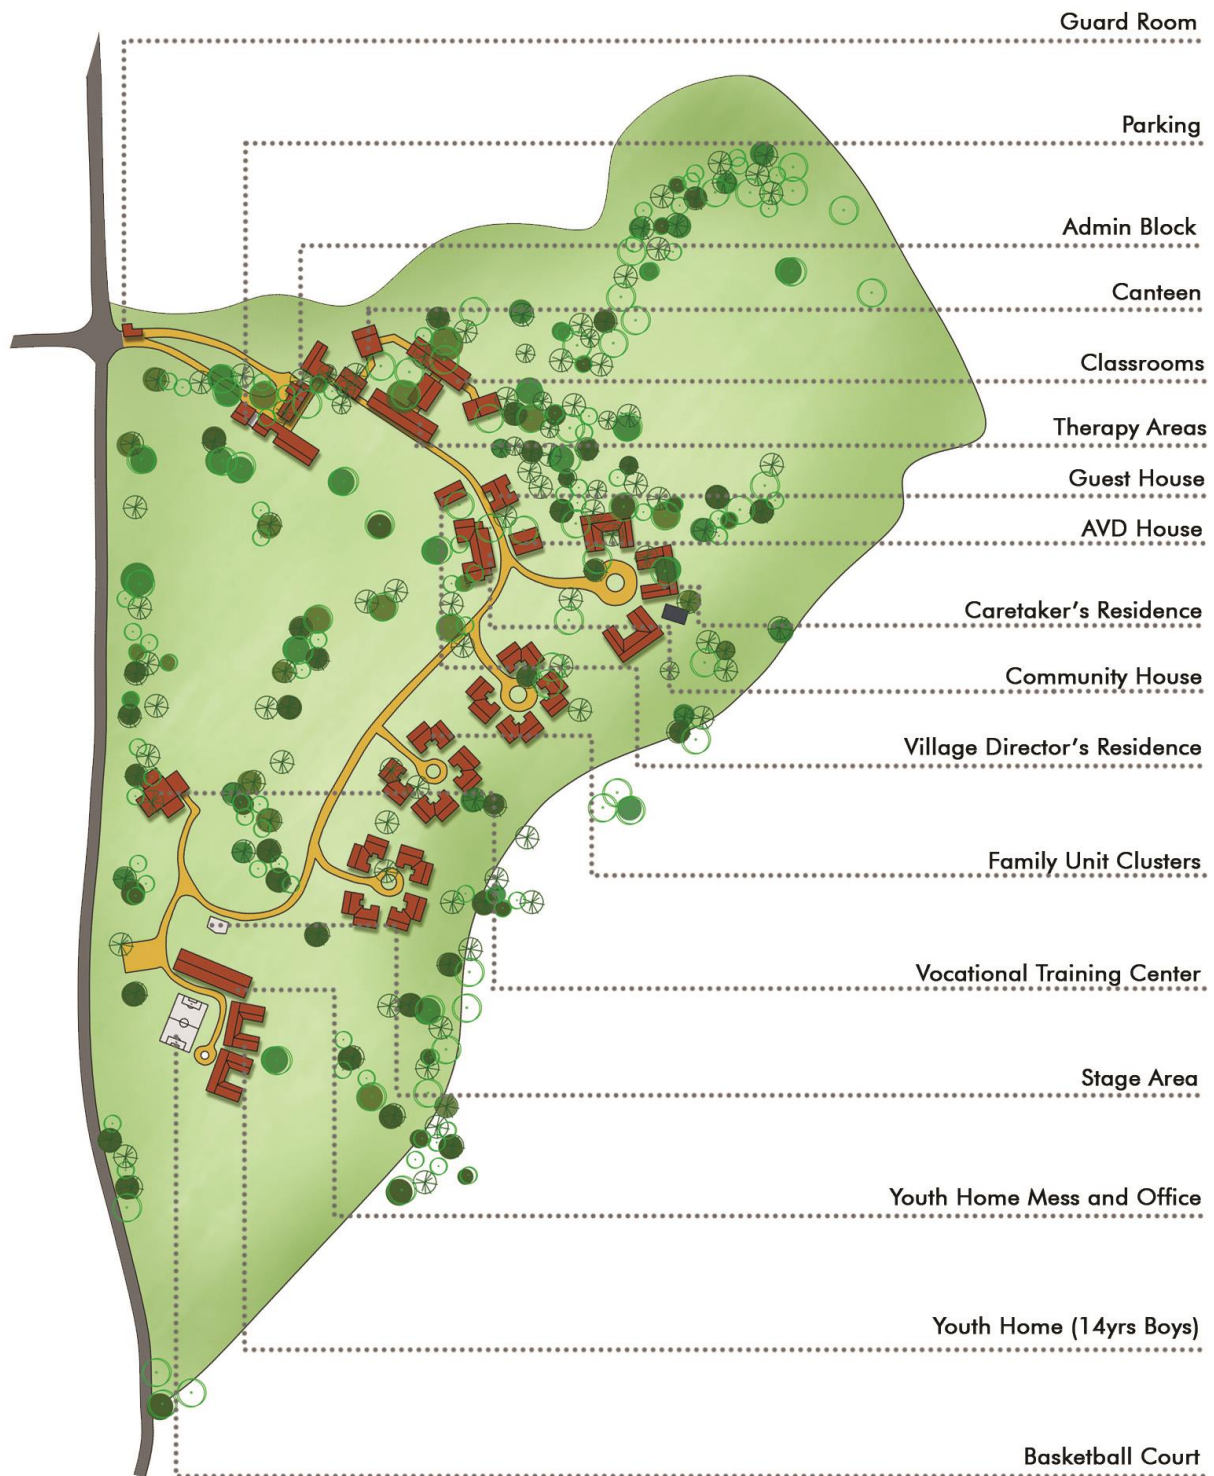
Site Plan of SOS Village, Khajuri Kalan <Author>
